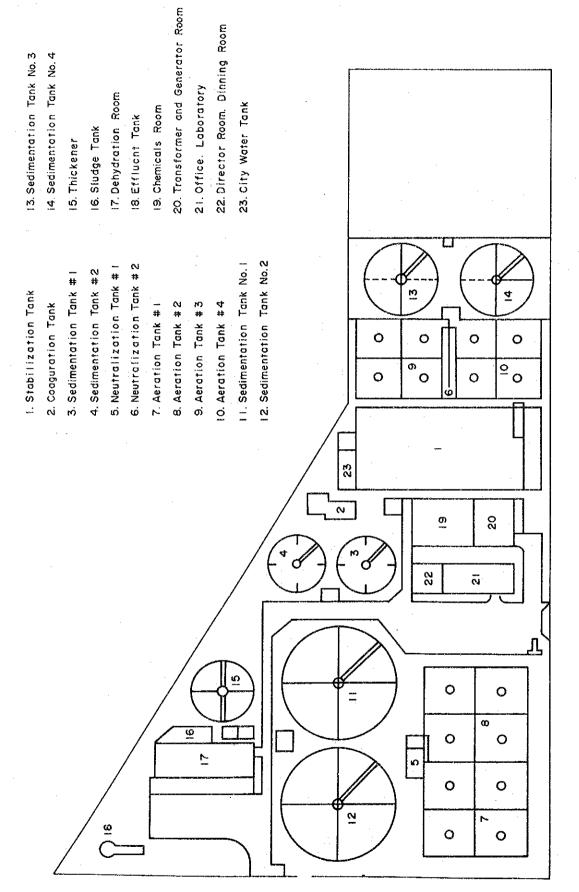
Layout of Central Waste Treatment Plant
